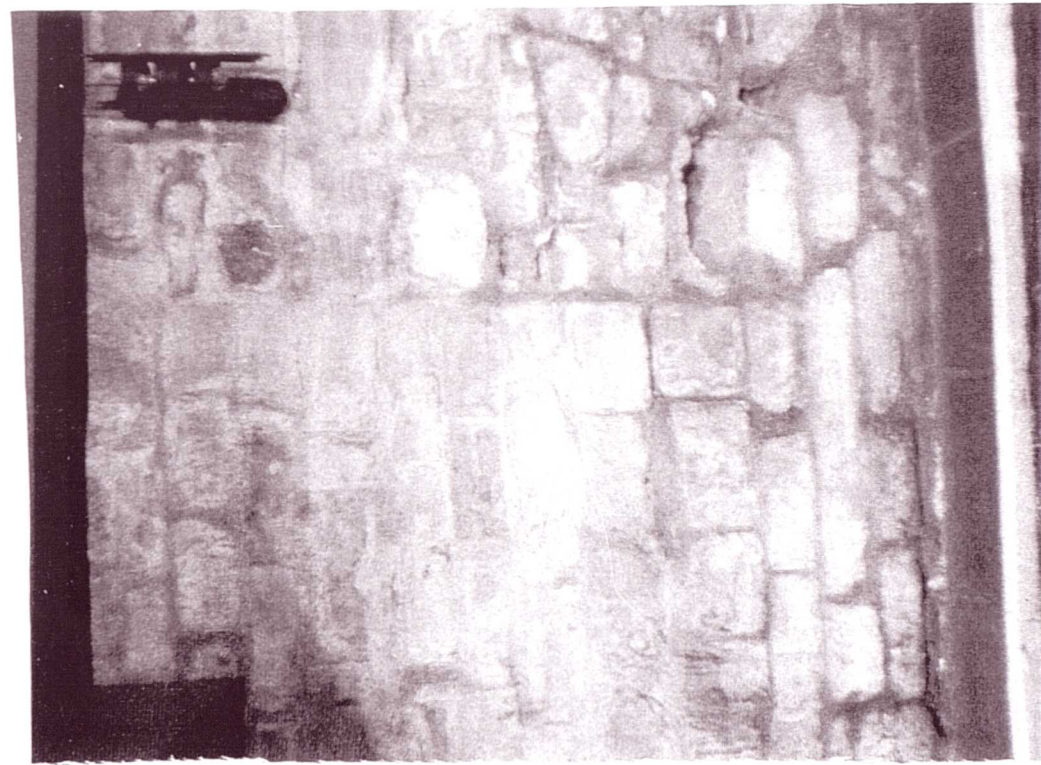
Wall face with double chamfered plinth concealed within fabric at the base of the Black Stairs
